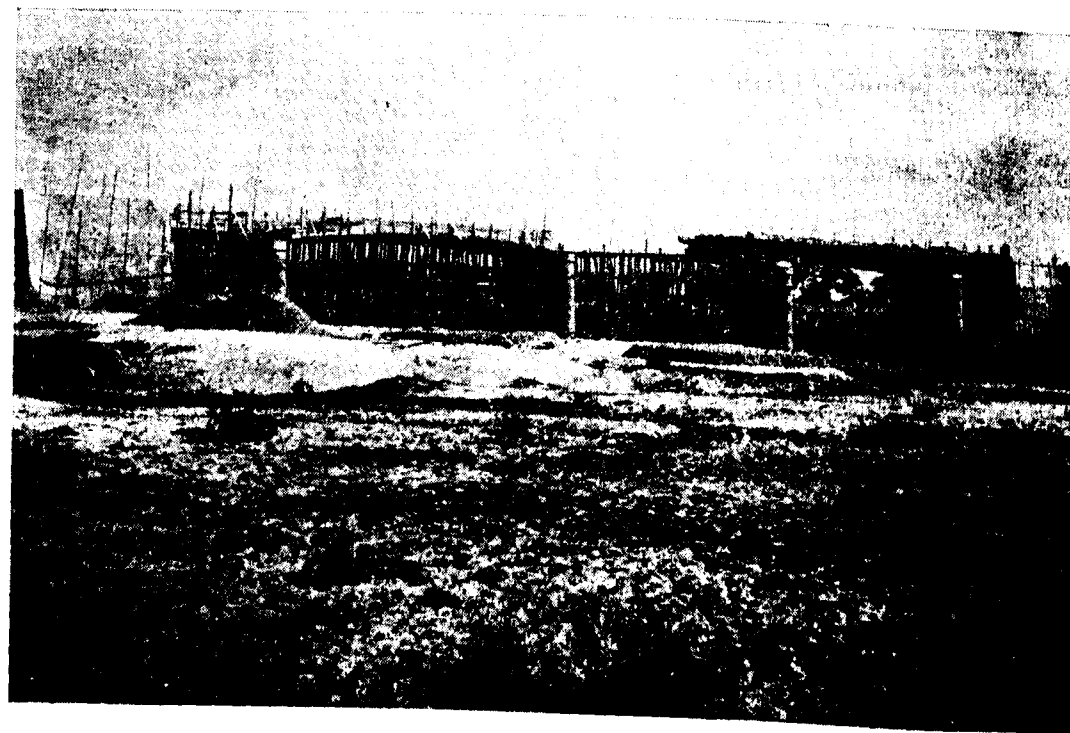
Nagar Bridge under construction on N.H. 34 (West Bengal) as on Oct., 1957
